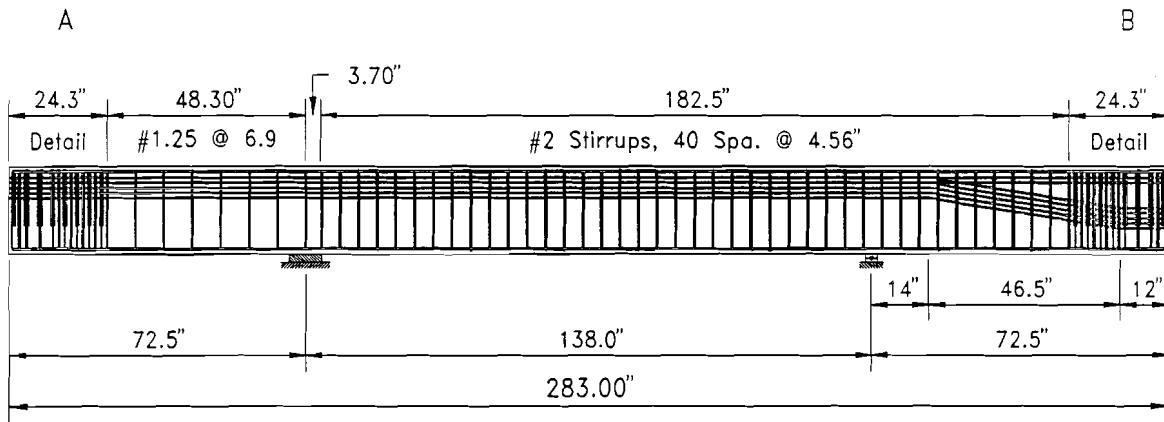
Beam 1B dimensions, stirrup locations, and tendon drape points.
